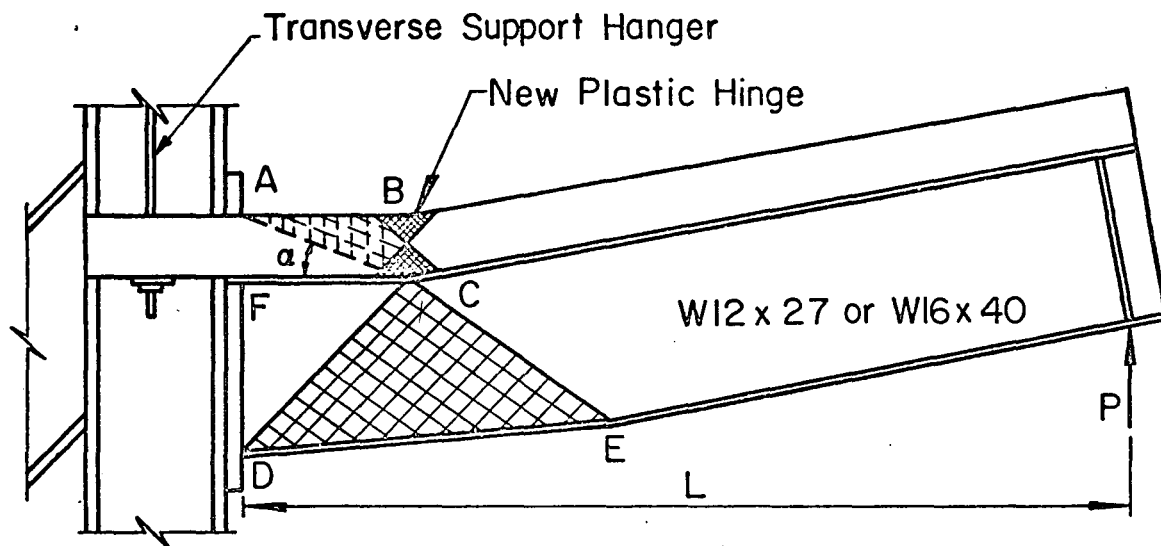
ASSUMED FAILURE MECHANISM FOR CONNECTIONS WITH TRANSVERSE SUPPORT
